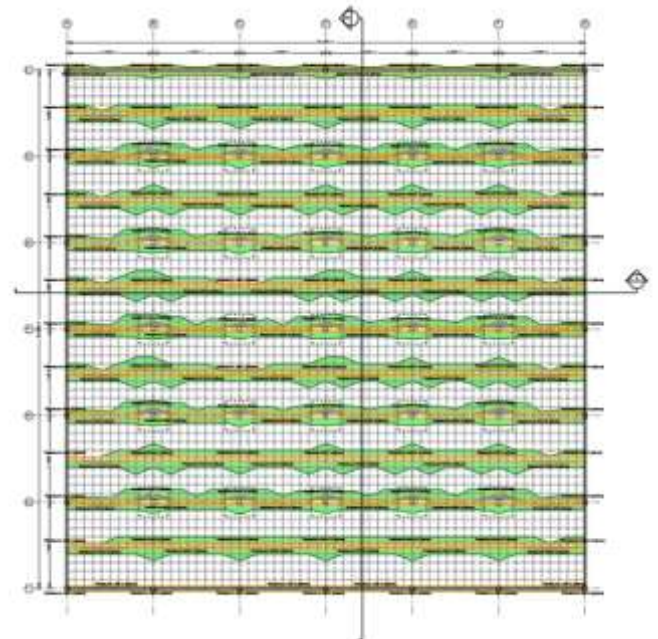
Reinforcement profile for Waffle Slab 6x6m.
